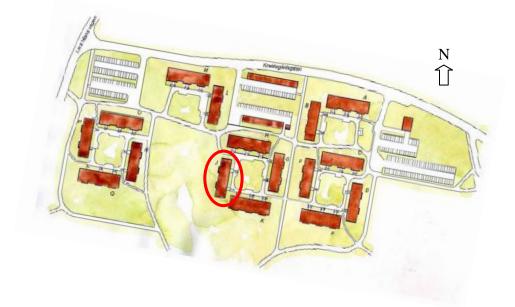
Site plan, Brogården housing estate. The studied House J is marked.(Source: Alingsåshem AB)
